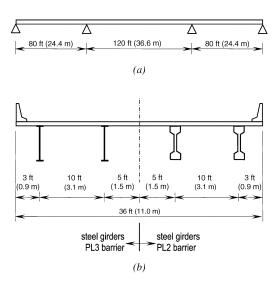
Details of example bridges: (a) elevation; and (b) cross section.
